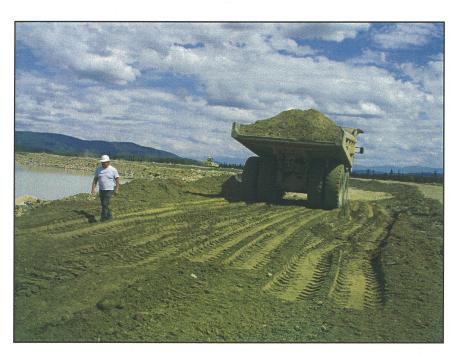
Placing Zone S material with a 777 haul truck on the Perimeter Embankment.
